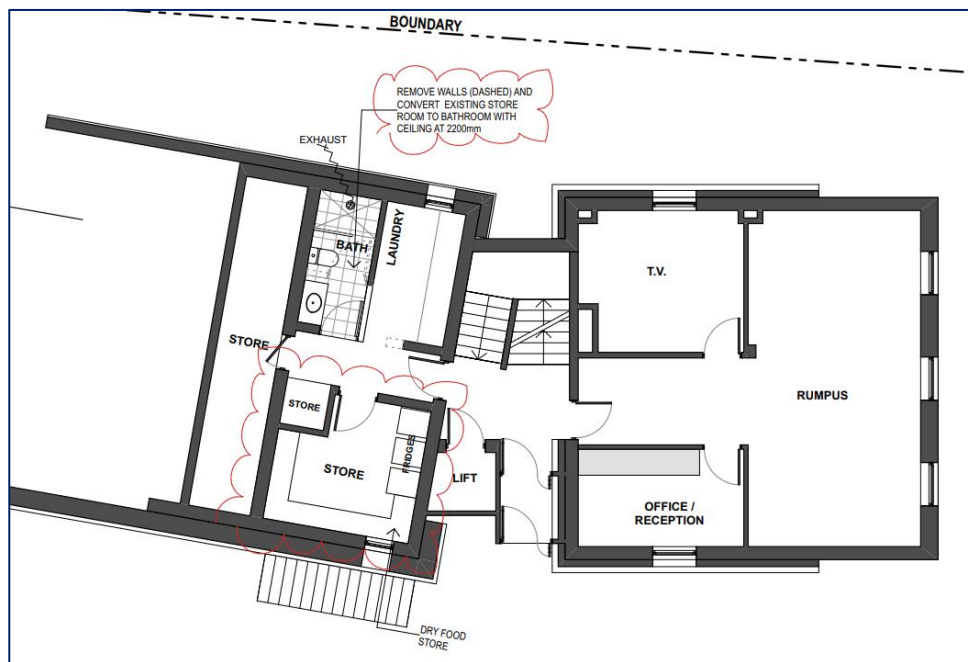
| Level 1 bathroom, laundry and storeroom modifications (Source: Applicant's documentation)
